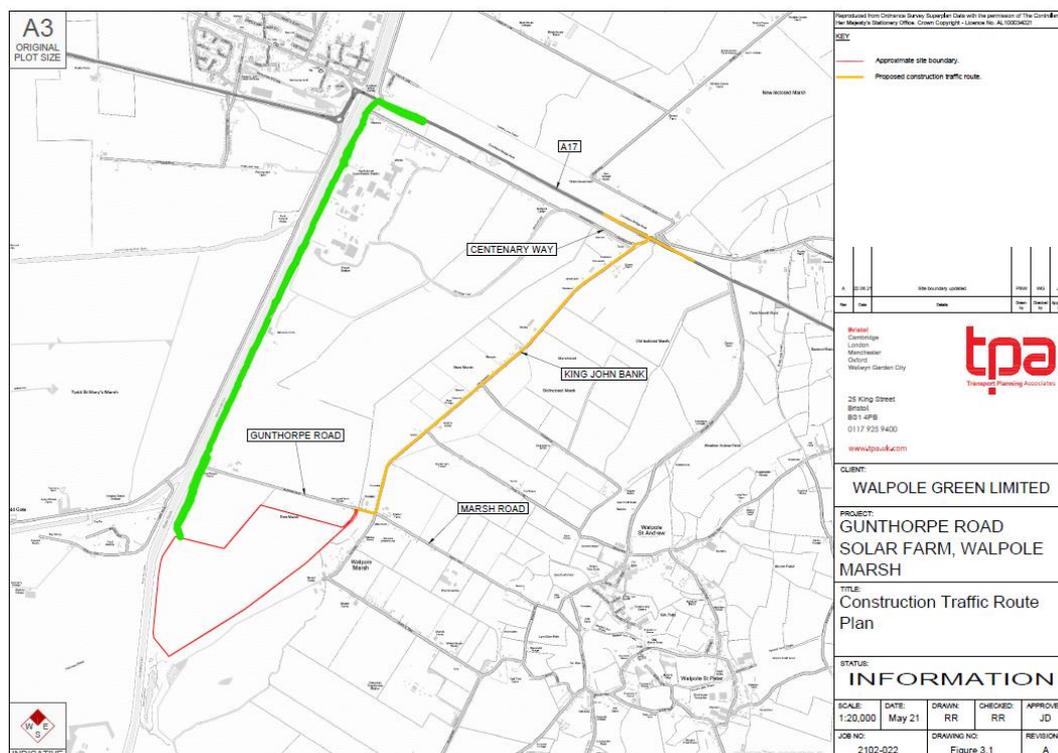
Extract of CTMP Figure 3.1 Rev A, dated May 2021 (new additional AIL route shown green).
